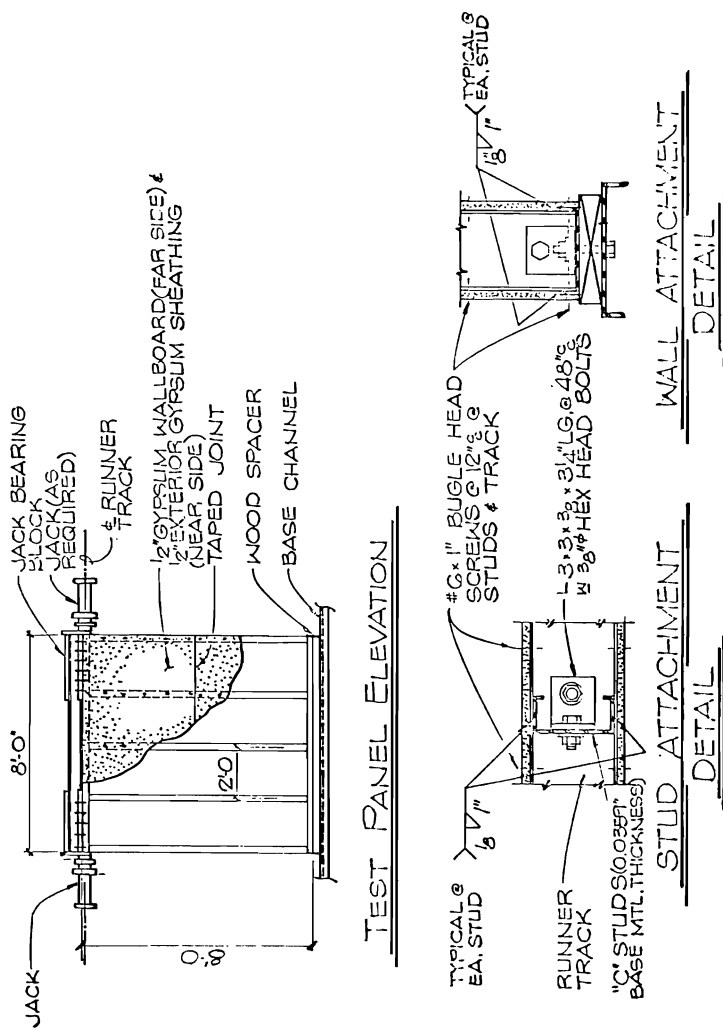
Test Assembly Plan & Details - Wall Type "M"
